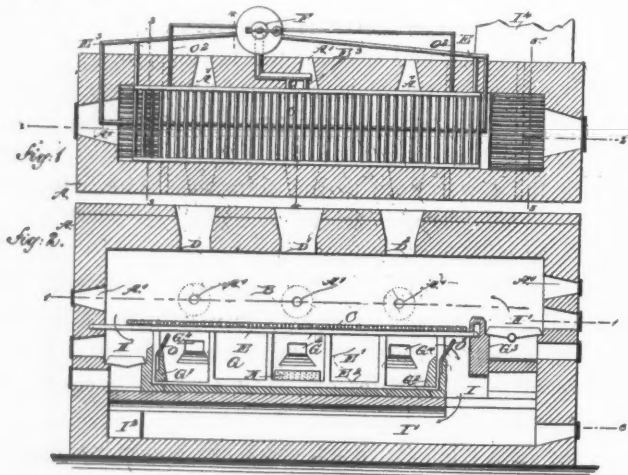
PLAN AND SECTION OF BROWNLEE GARBAGE FURNACE
